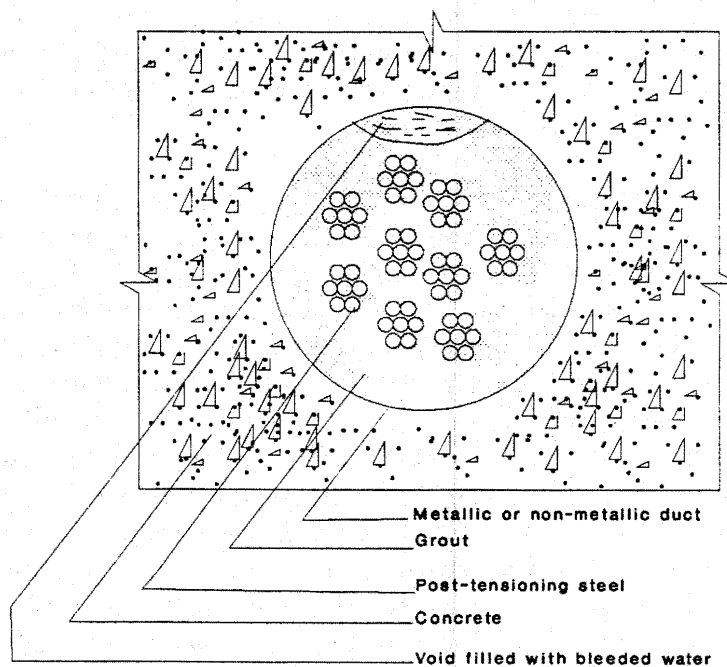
Cross section of a concrete element with post-tensioning tendon.
